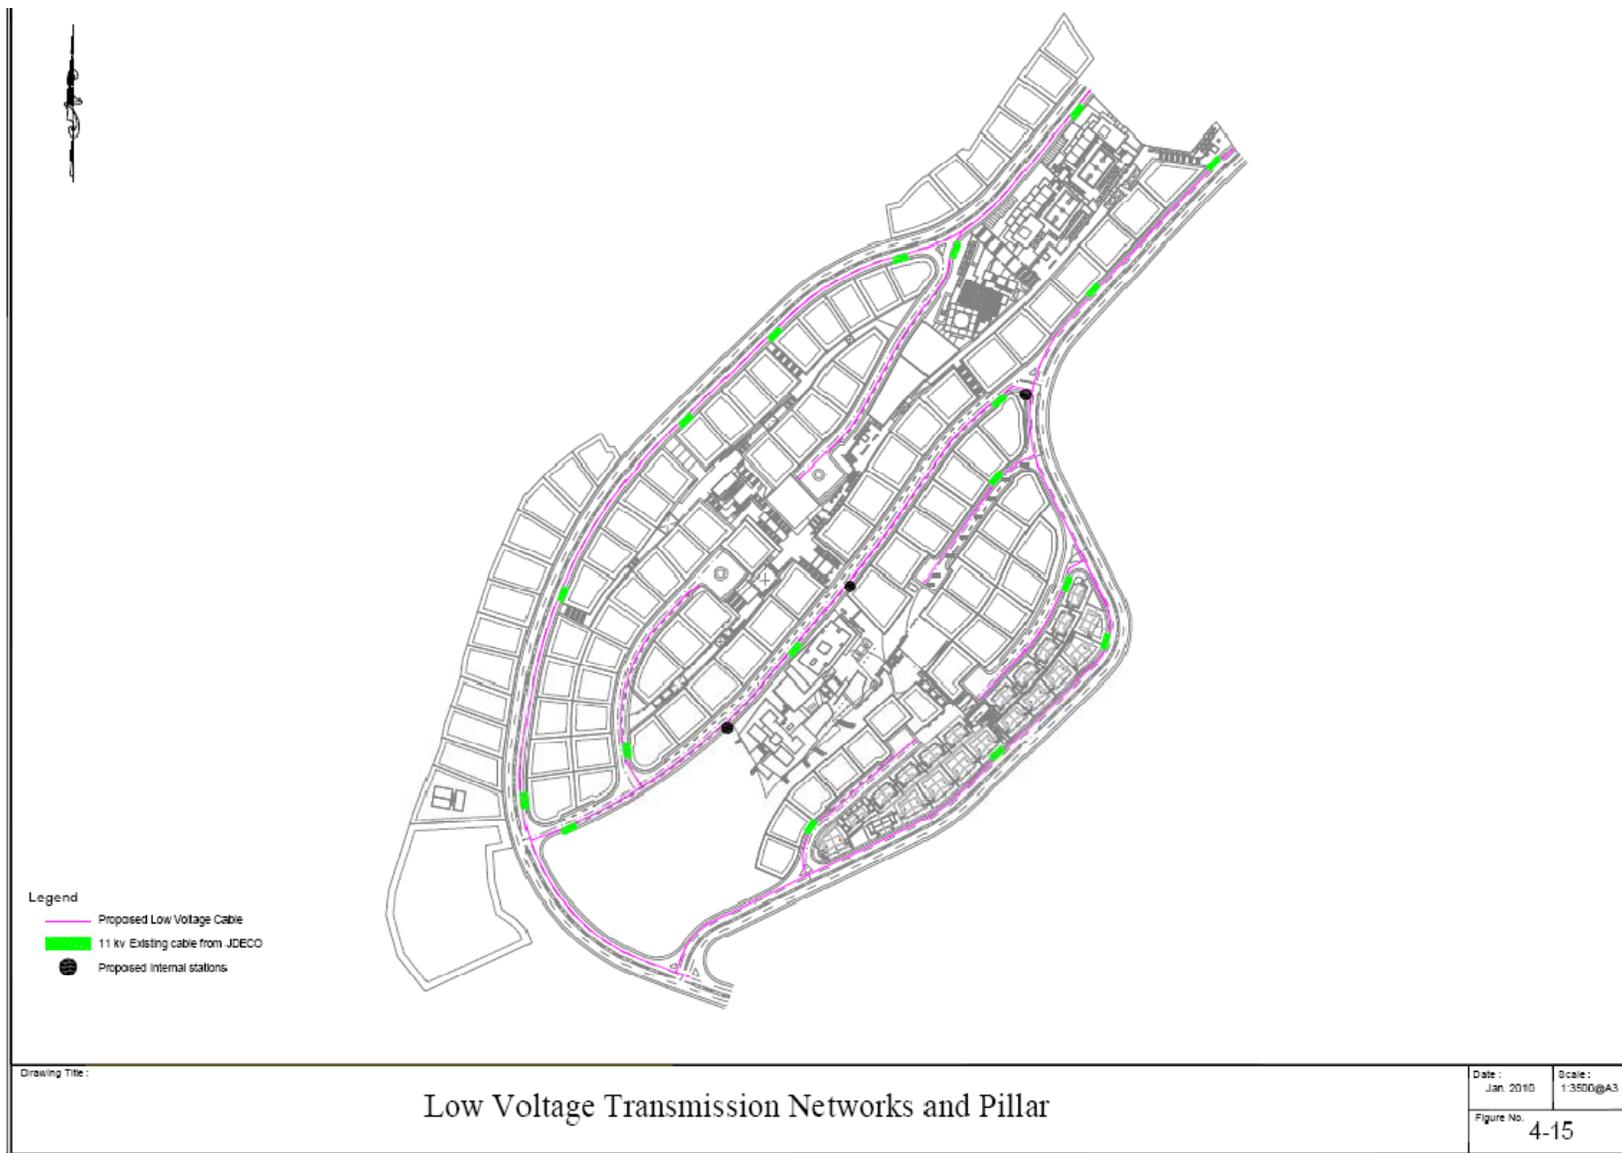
Site Plan for the Proposed Underground Low Voltage Electrical network and Pillars
